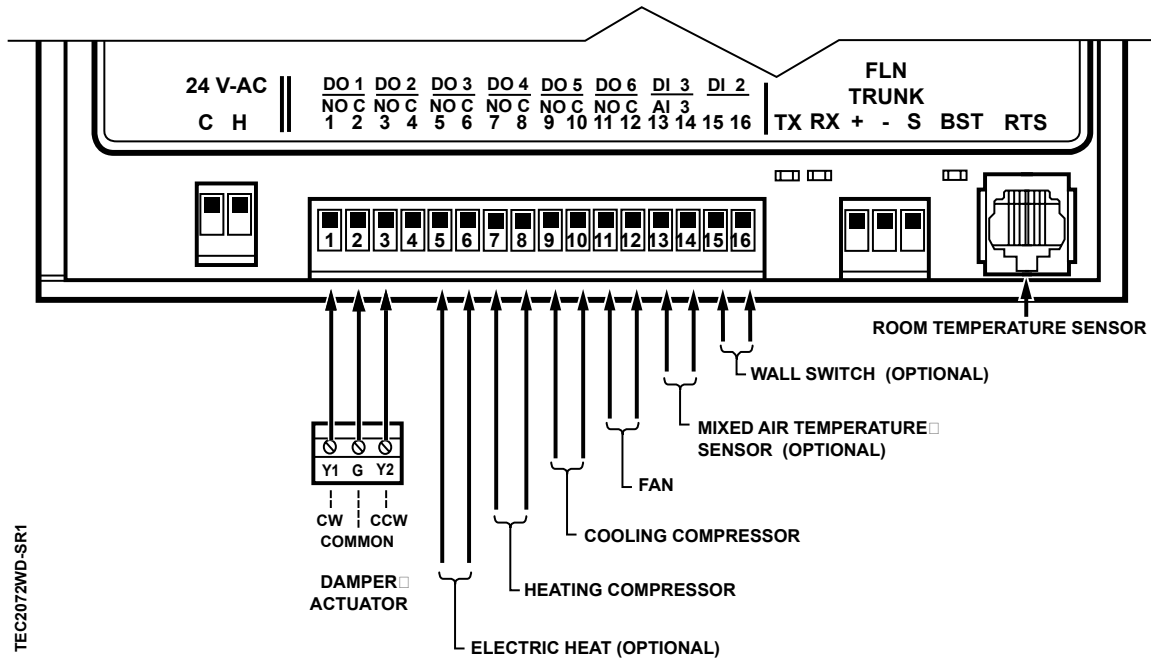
Application 2072 (Heating and Cooling Heat Pump without Reversing Valve Control and with Mixed Air Control).
